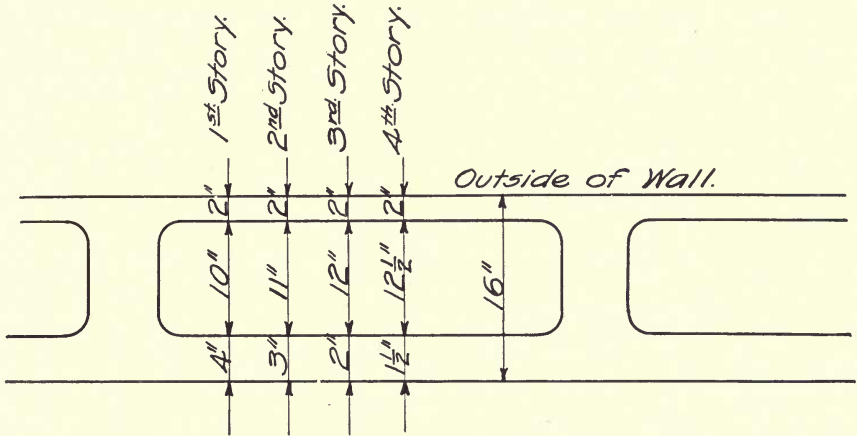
Typical Horizontal Section of Wall. (See p. 51.)
